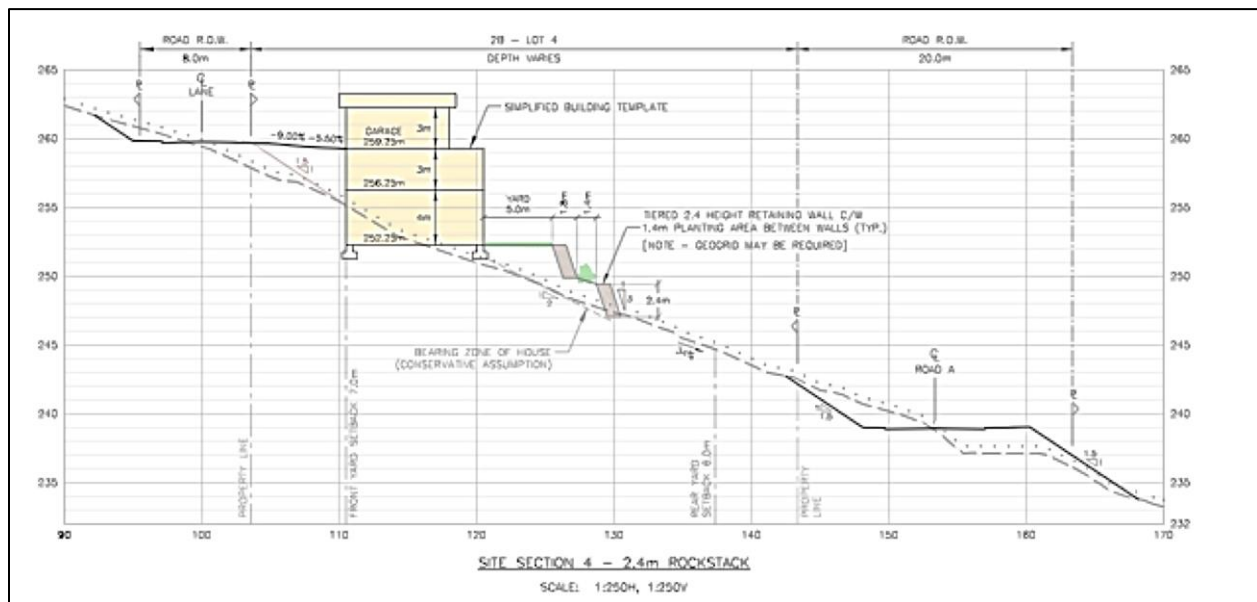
Rockstack Illustration (Lot 4) - 2.4m Retaining Structures
